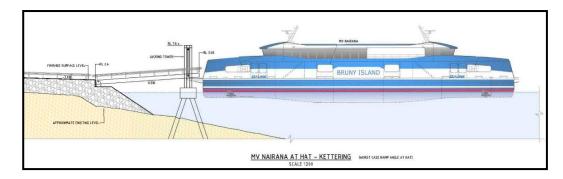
Elevation showing the proposed jacking tower with max RL 7.6
